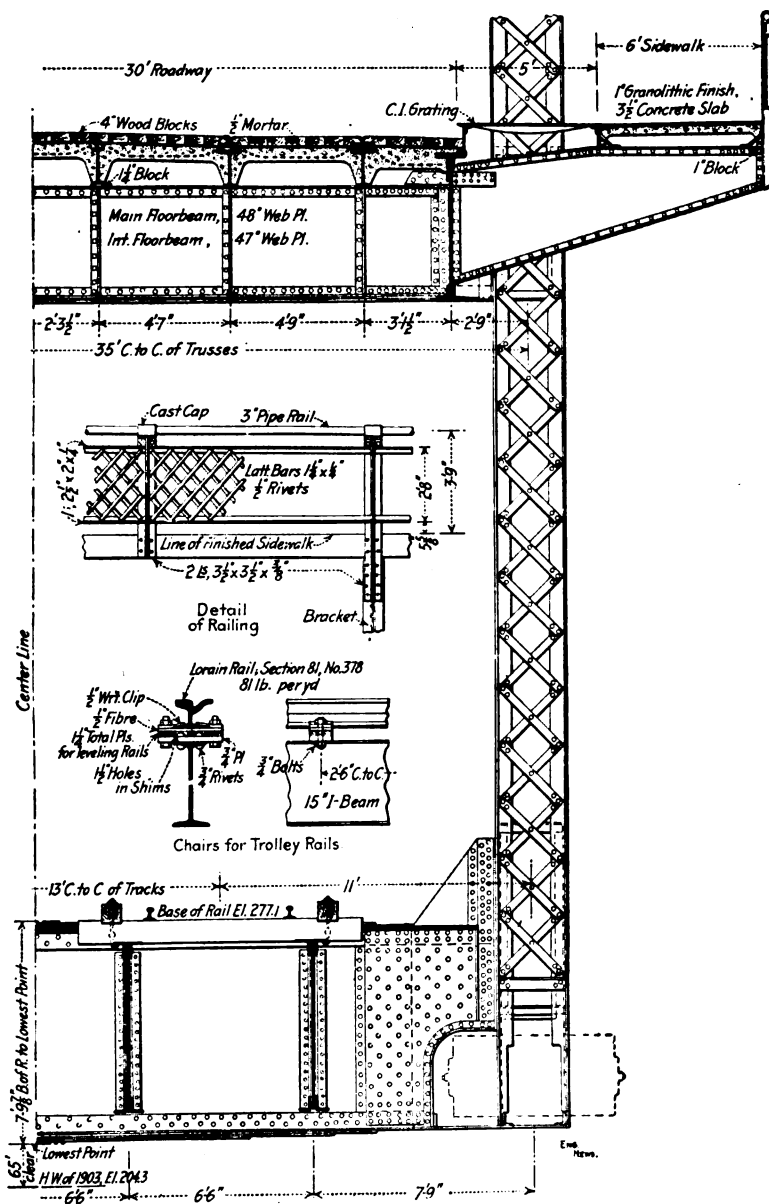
HALF CROSS-SECTION OF THE MUNICIPAL BRIDGE AT ST. LOUIS, MO.
